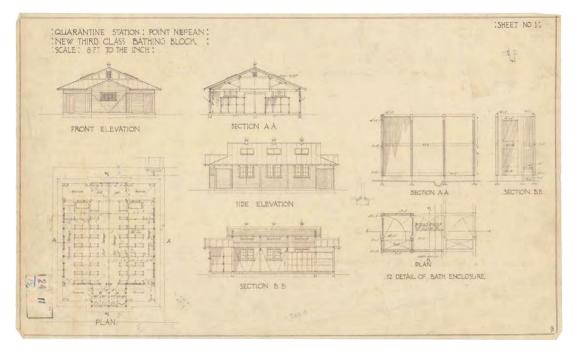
Quarantine Station: Point Nepean, New Third Class Bathing Block. Sheet No 1. Note the skylights to the side roof planes. Source: National Archives of Australia.
